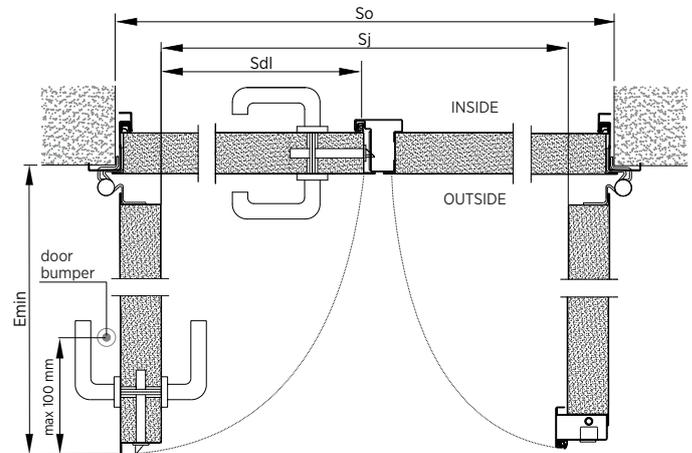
Installation in front of the opening of the double-leaf door – corner frame with-out a thermal break – horizontal cross-section
